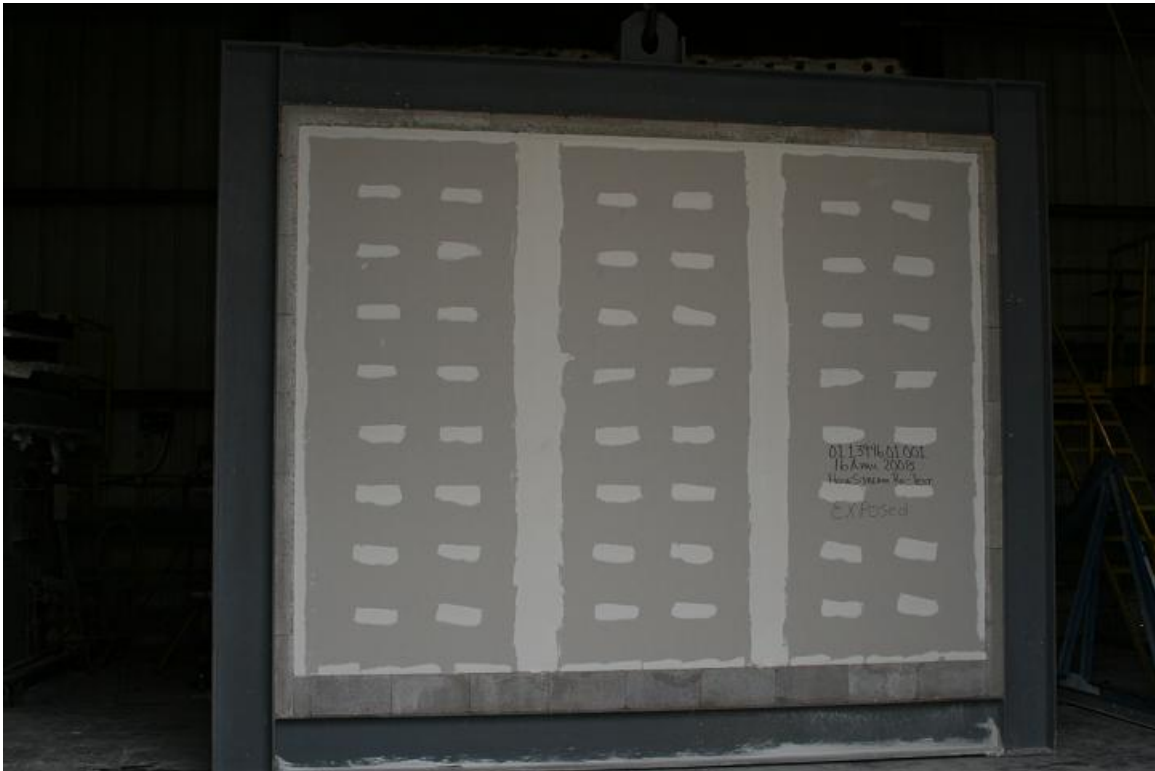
Exposed Face of Hose Stream Test Wall prior to Furnace Exposure.
